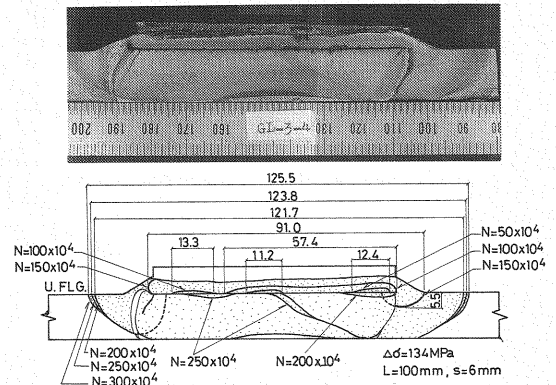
Fracture Surface of Root Crack (B 44).
